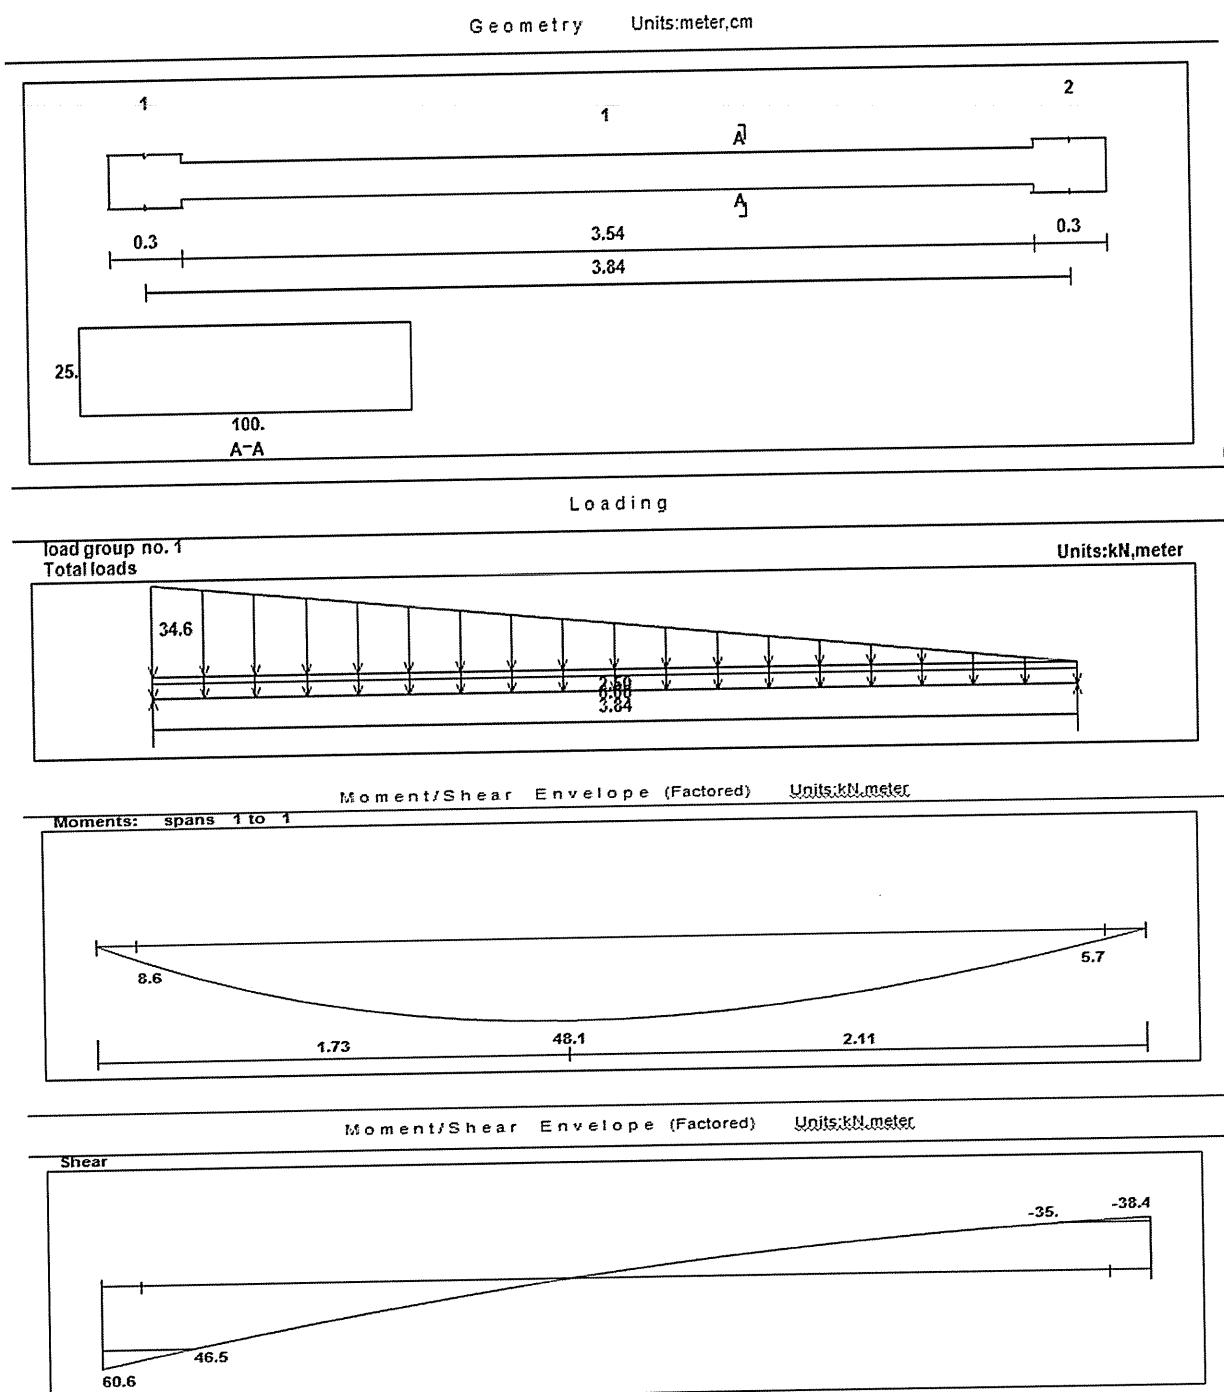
Loading and Envelope of Basement Wall (BW1)
